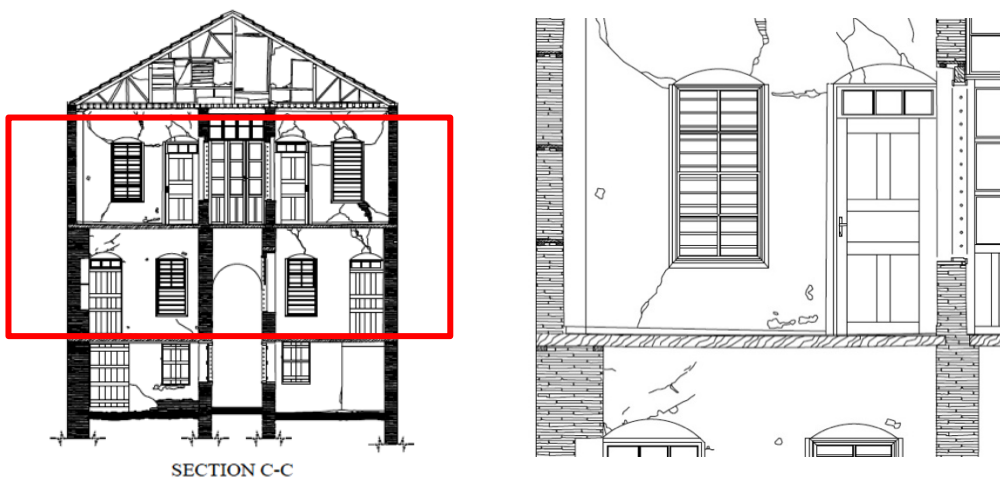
Adana-Tepebağ case study house: On the right section C-C and the left, timber slab, and load-bearing wall joint detail are shown [1].
